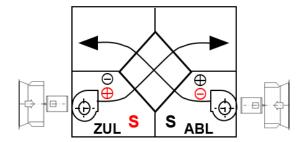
supply air pressing, exhaust air pressing; 2 pressure switch (S), 4 measuring points (+/-)
